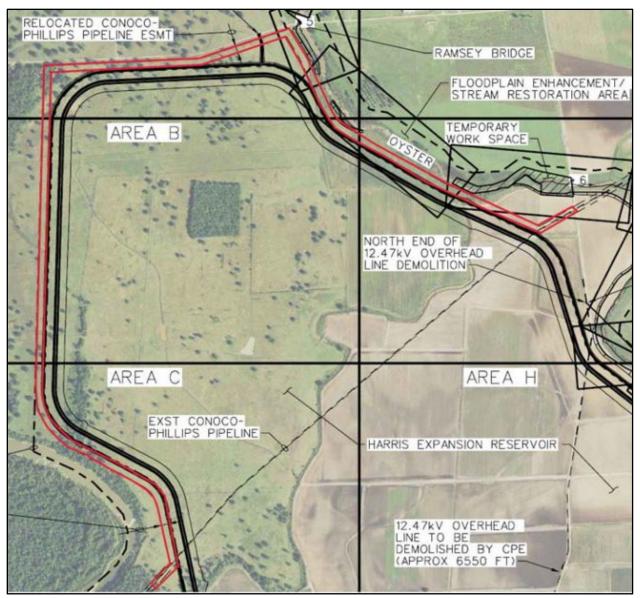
Existing ConocoPhillips pipeline and proposed route (Jacobs 2018b).
